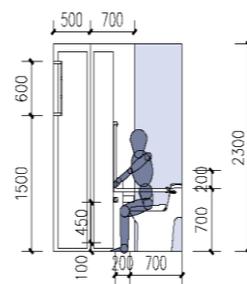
Modified Elevation of the Toilet Area in the Kitchen-Side Bathroom (Source: Self-drawn)
